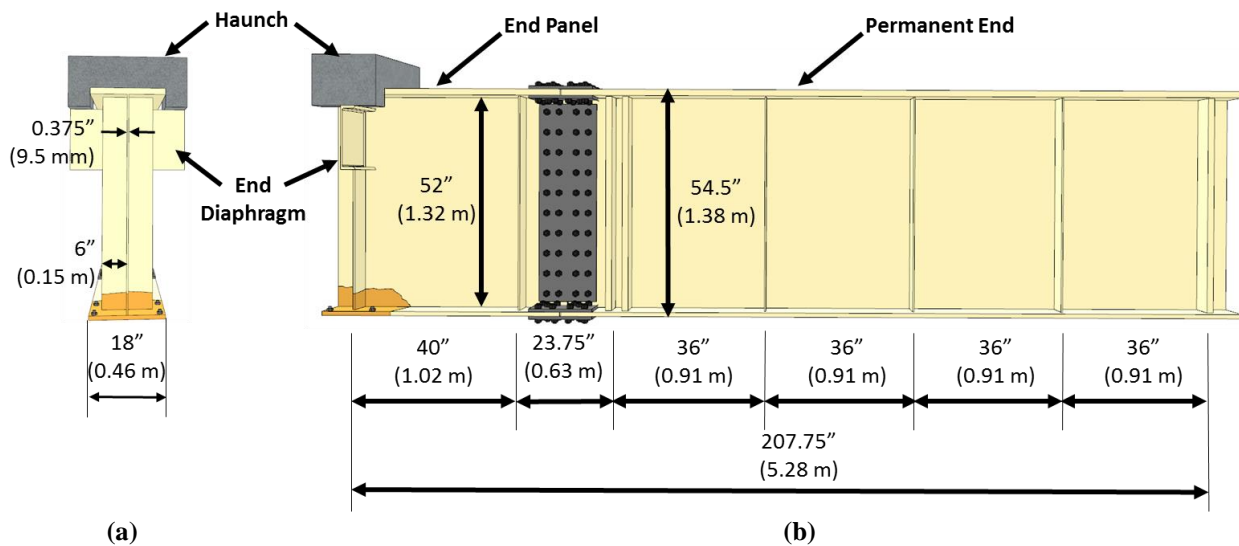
Final plate girder design: a) Cross-section; b) Elevation
